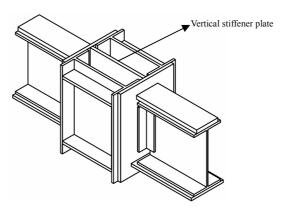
Using vertical stiffener in "common moment connection" with double-I built-up column
